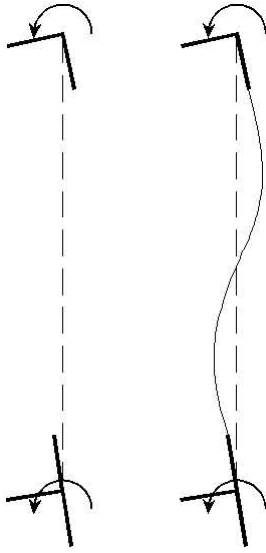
Frame and column forces for Example 10.3-1.
